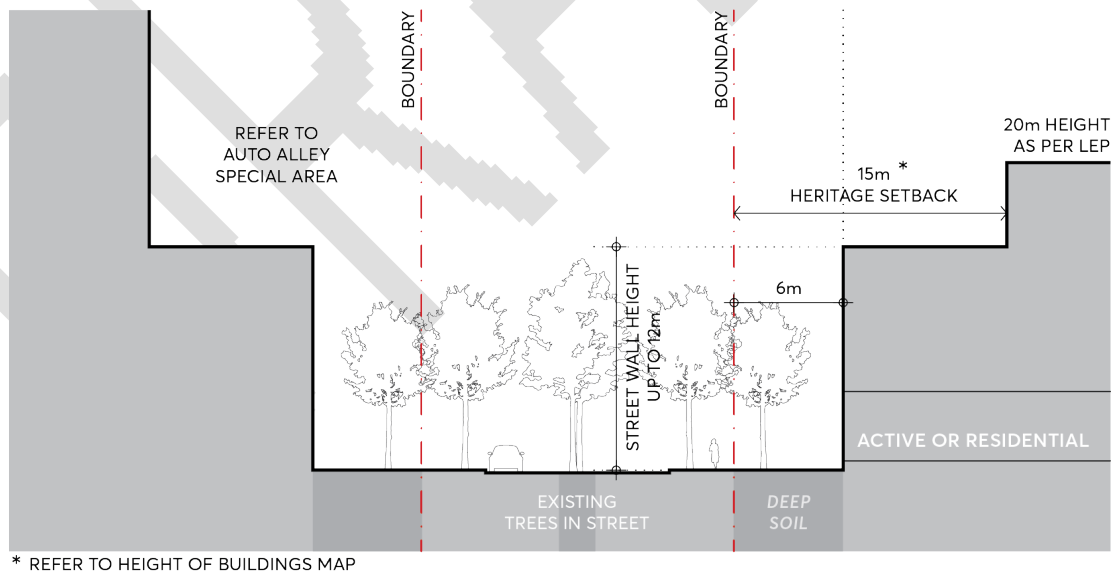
High Street (Section B) Setbacks and Street Wall Height
